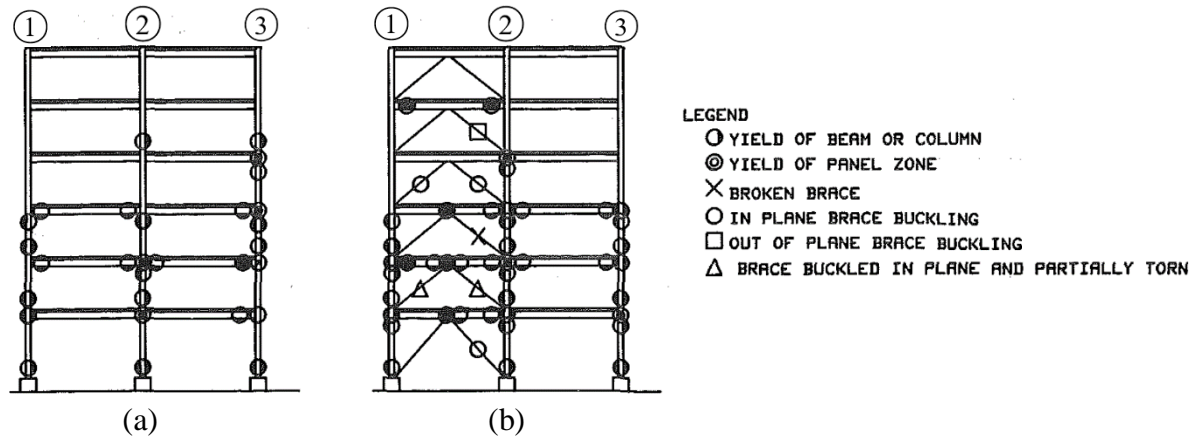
UJ-CERP 6-story steel building, observed damage in: (a) MRFs: elevation lines [A] and [C]; and (b) CBF: elevation line [B] (modified from Foutch et al., 1987).
